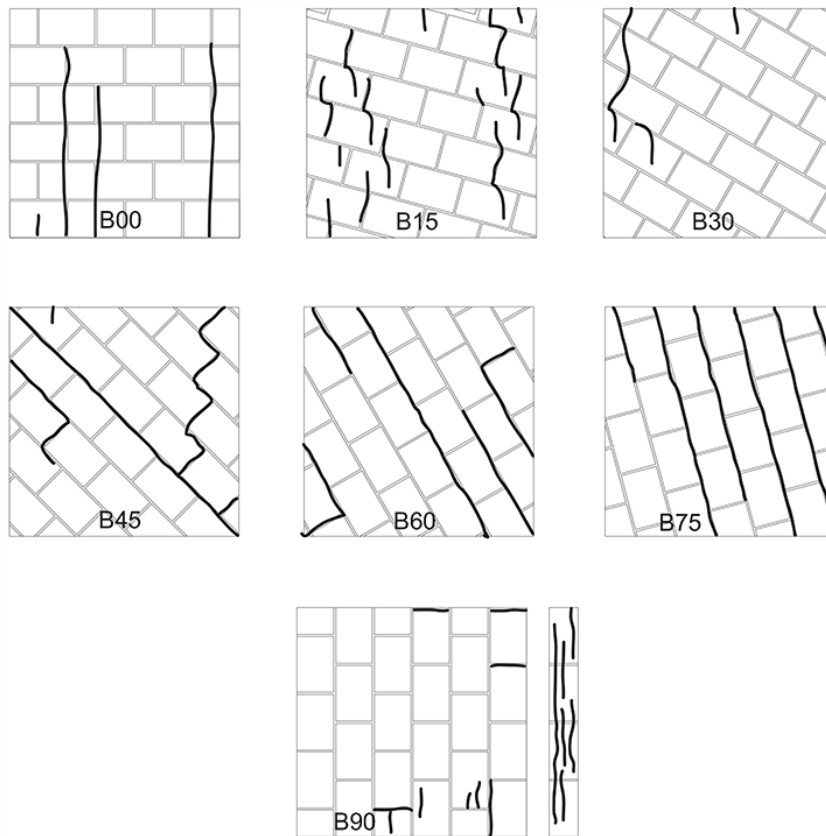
Crack patterns of the wallettes with inclined bed joints at failure
